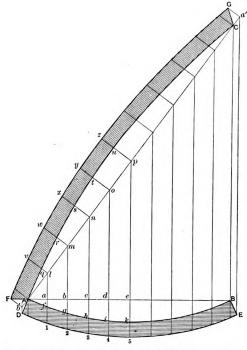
Method of Laying Out Face Mold for Diagonal Bar for
